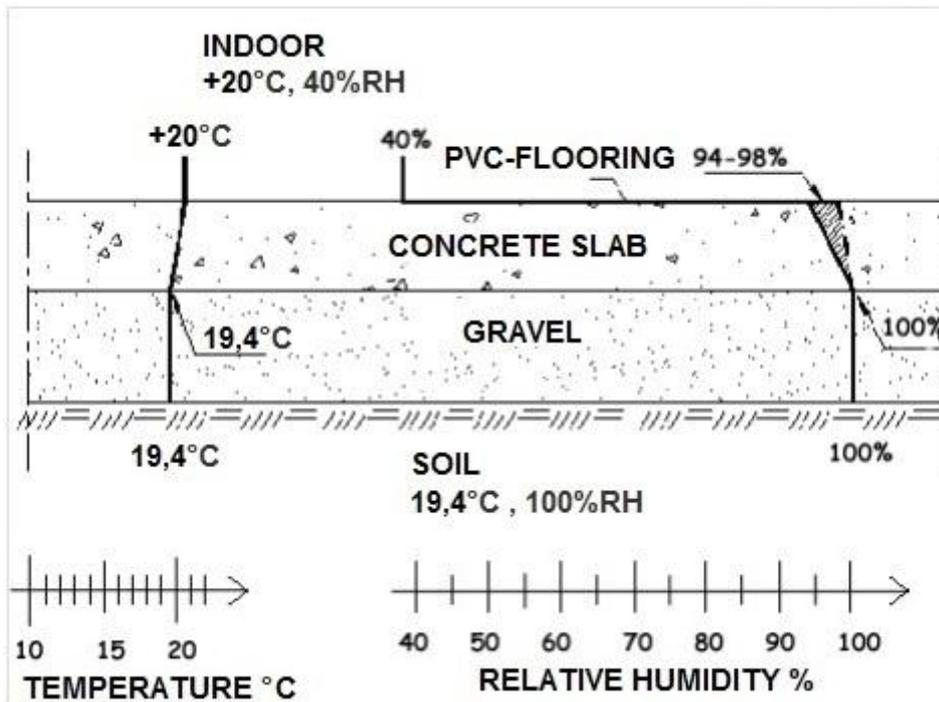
Expected humidity levels in a concrete slab with PVC flooring and no moisture barrier or thermal insulation under the slab
